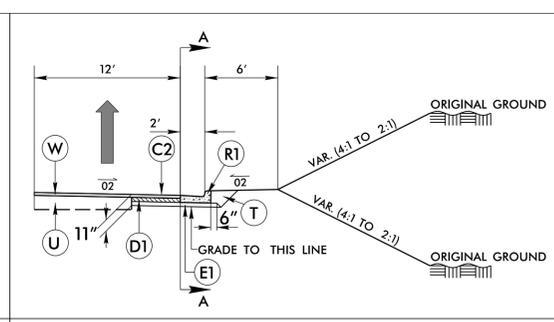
DETAIL SHOWING MILLED PAVEMENT PROFILE TIE-IN
